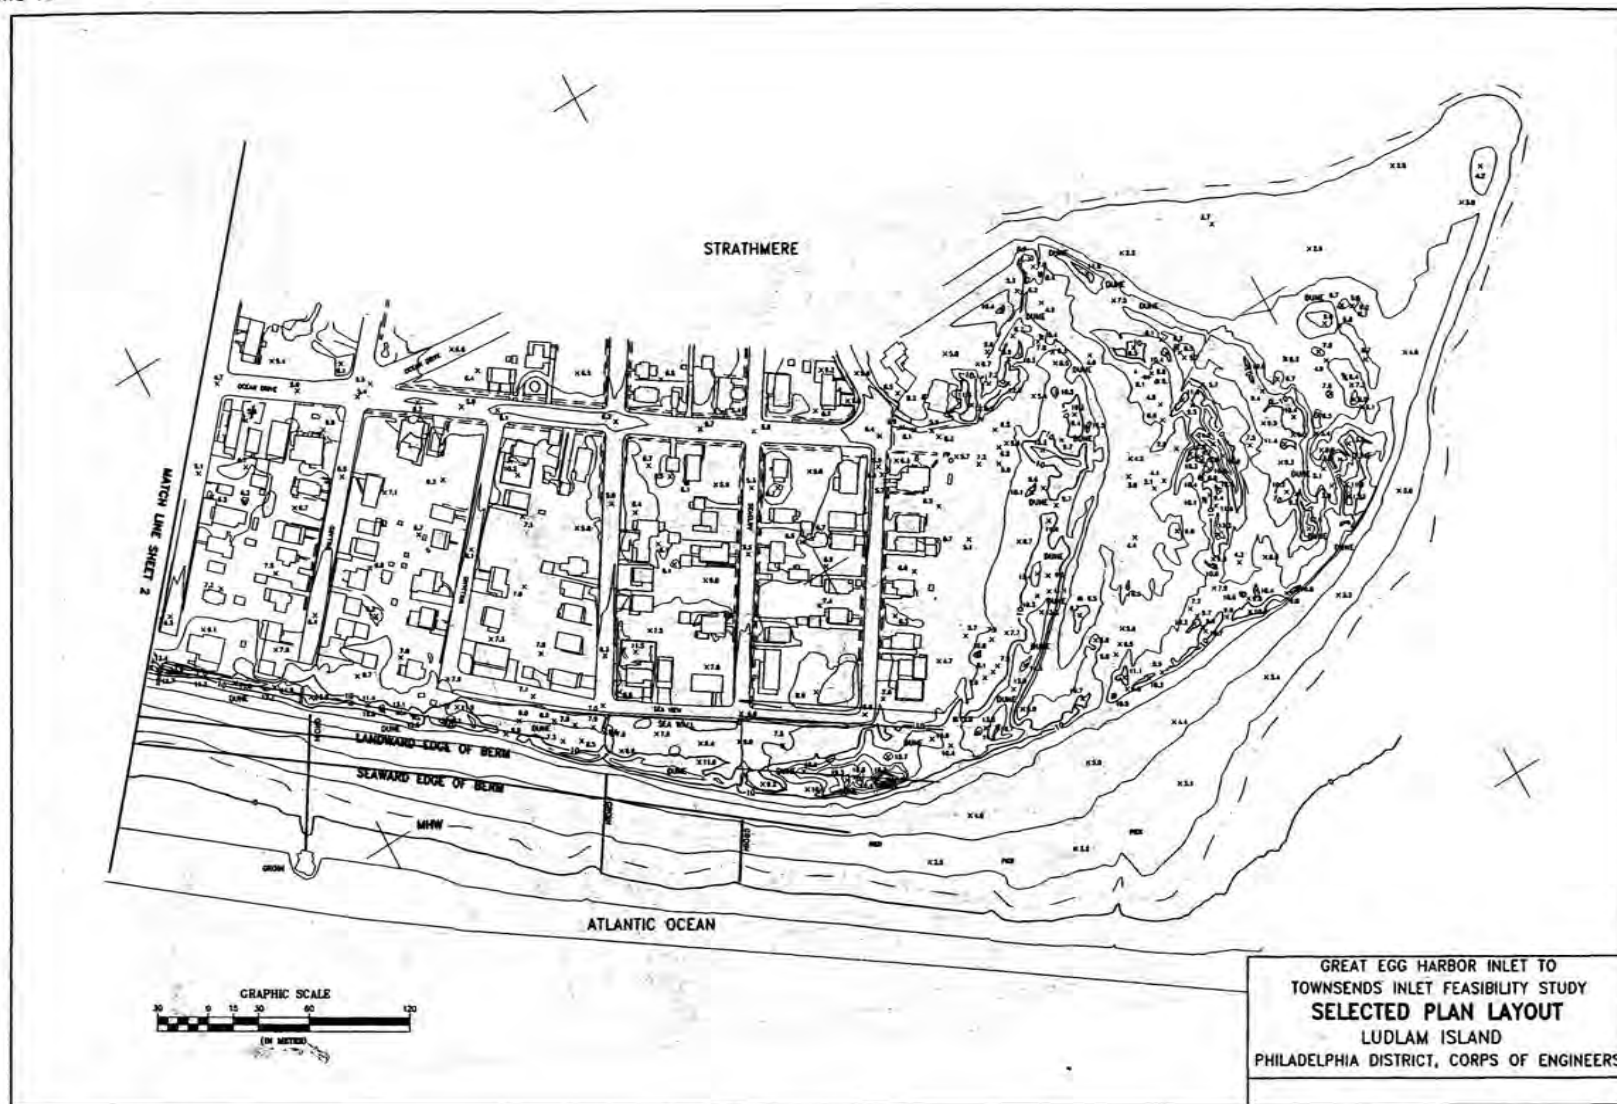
Selected Plan Layout for Ludlam Island, NJ – Corson’s Inlet to Whittier Ave, Strathmere
